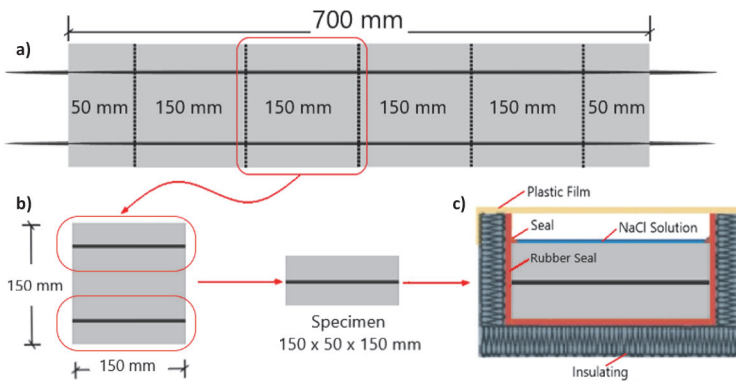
a) Prestressed beam; b) cutting of specimens; c) Freezing thawing test setup
